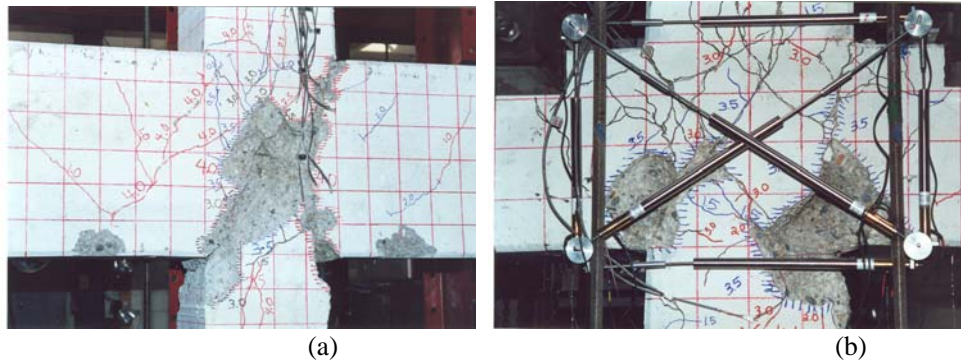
(a) As-built specimen 24-1 (Type I): joint shear failure mechanism, (b) As-built specimen 16-1 (Type II): bond failure mechanism of beam bottom steel bars at the joint.
